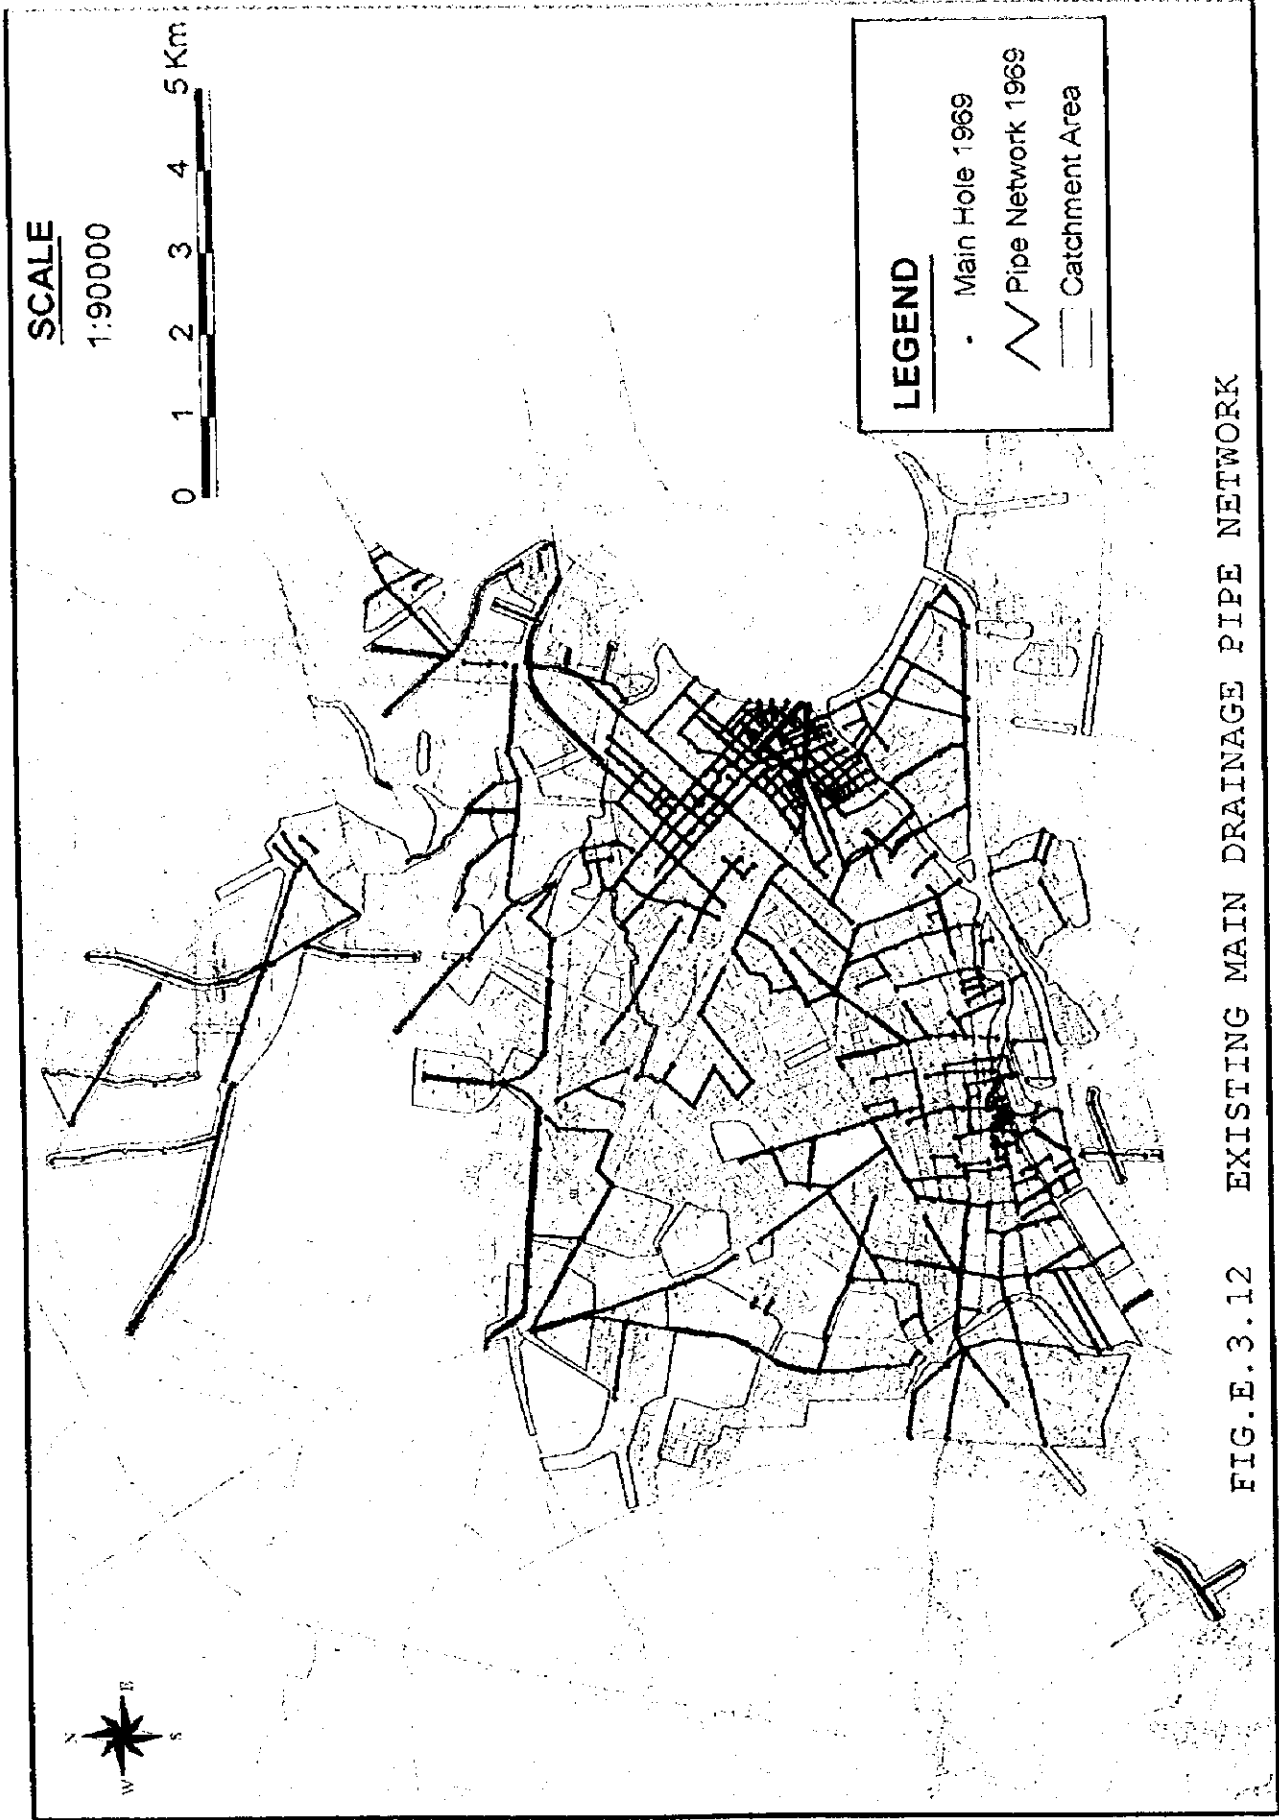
EXISTING MAIN DRAINAGE PIPE NETWORK
